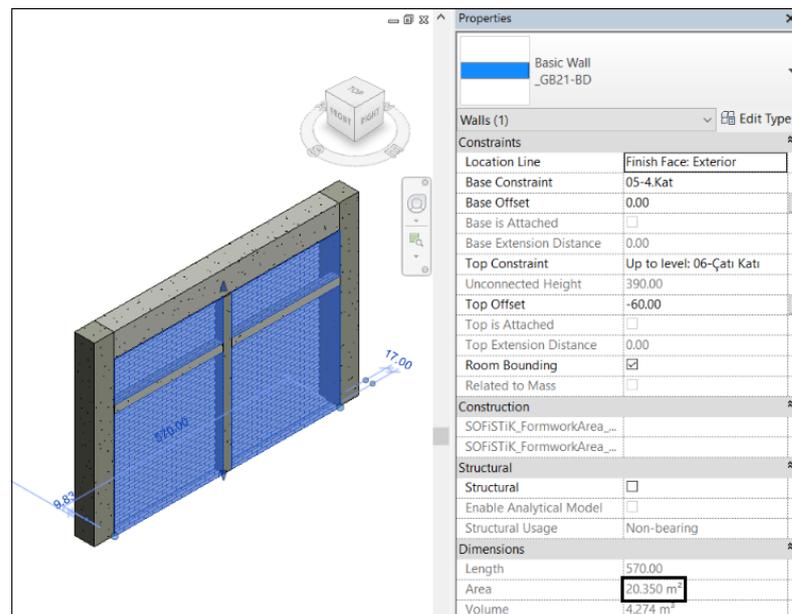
Area of an Architectural Wall (after Using Join Feature of Revit)
